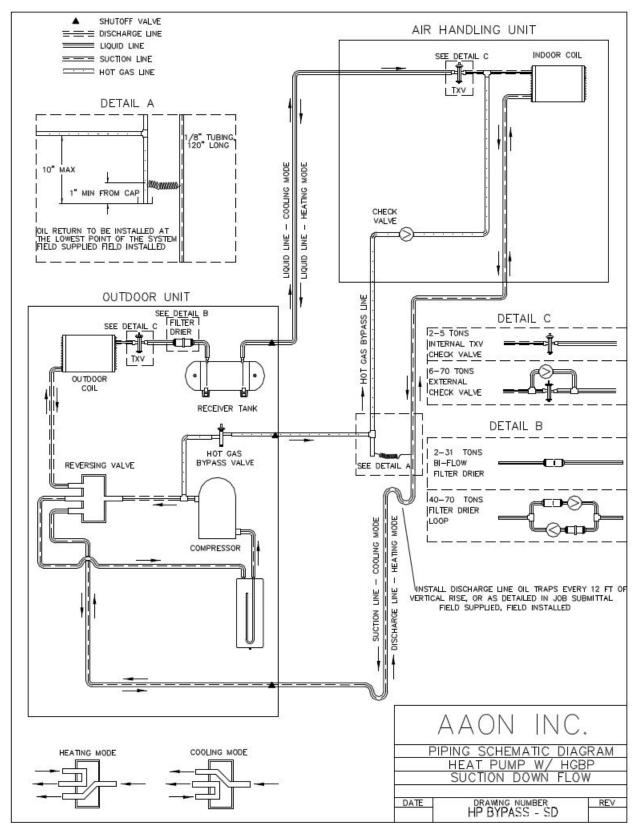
Heat Pump with Hot Gas Bypass Split System Piping, Suction Down
